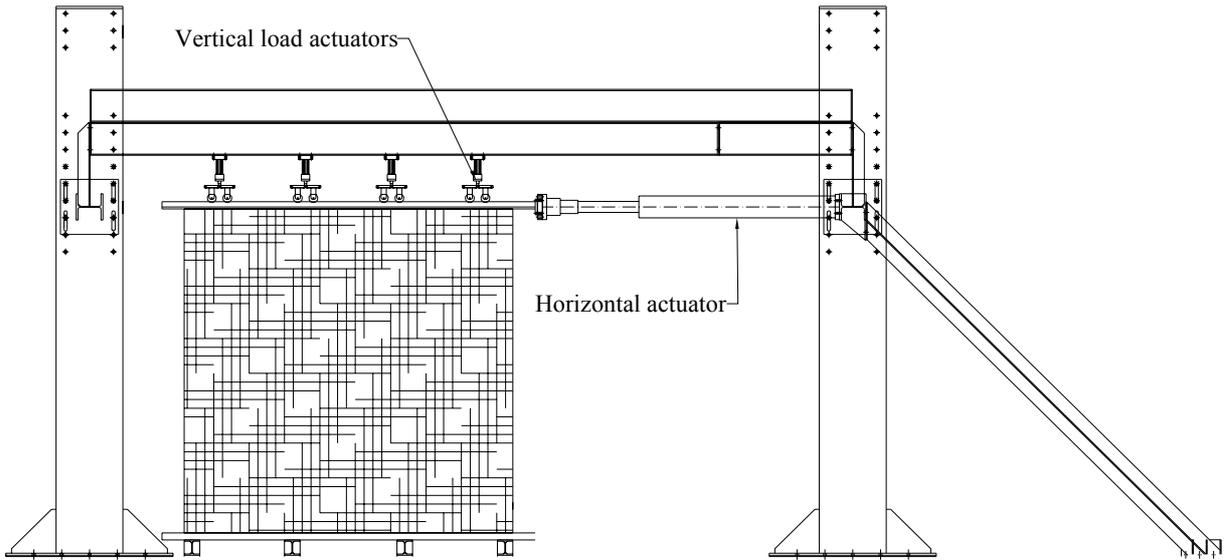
Test Set-up. For sake of simplicity upper stabilizing transverse steel beams are not reported.
